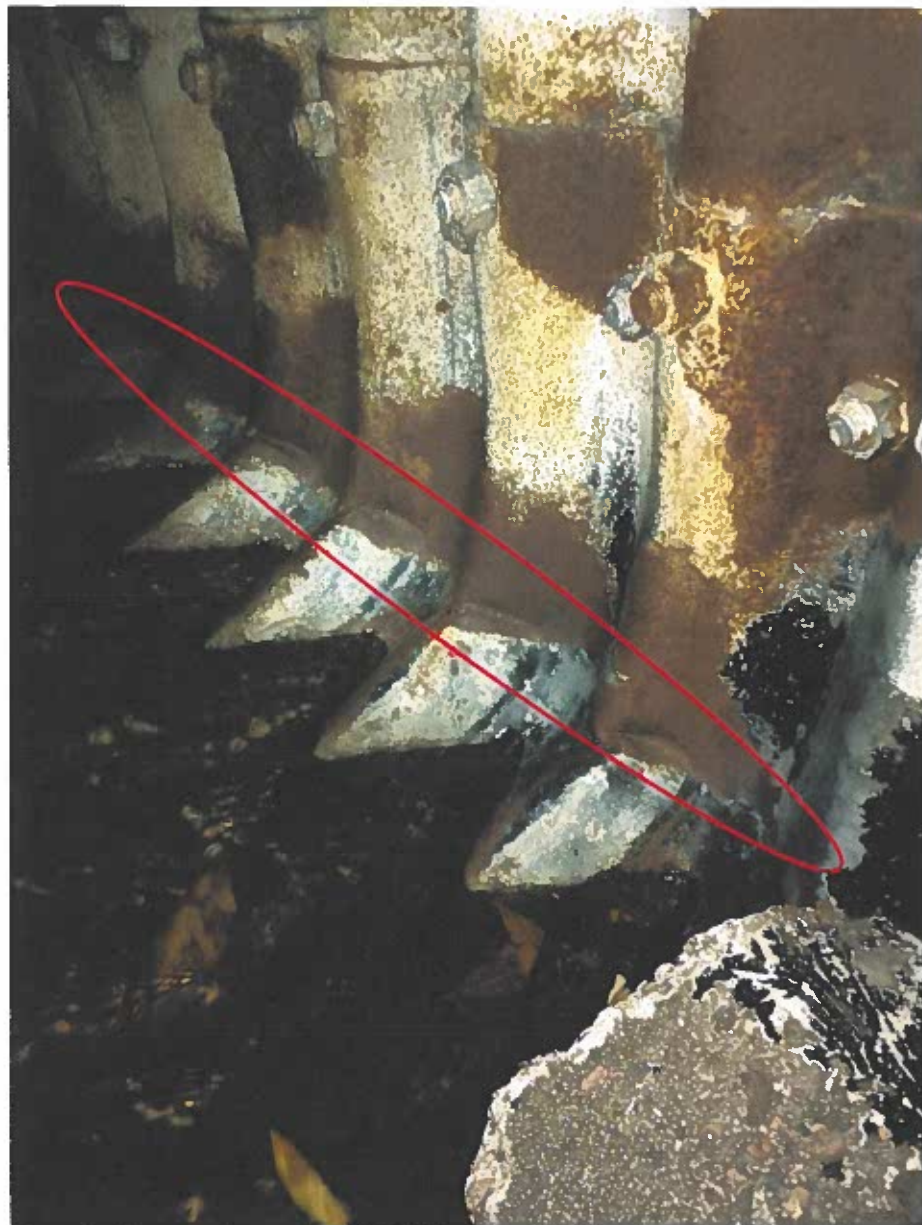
Image shows buckling of the lower radius near the concrete floor.
